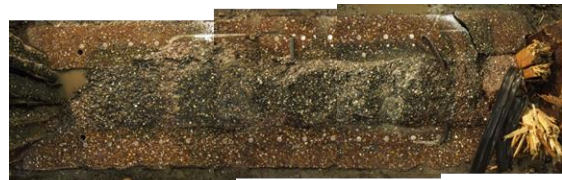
Cross section of Panel 1 at level NAP-6m, showing different truckloads of concrete in- and outside the reinforcement cage.
